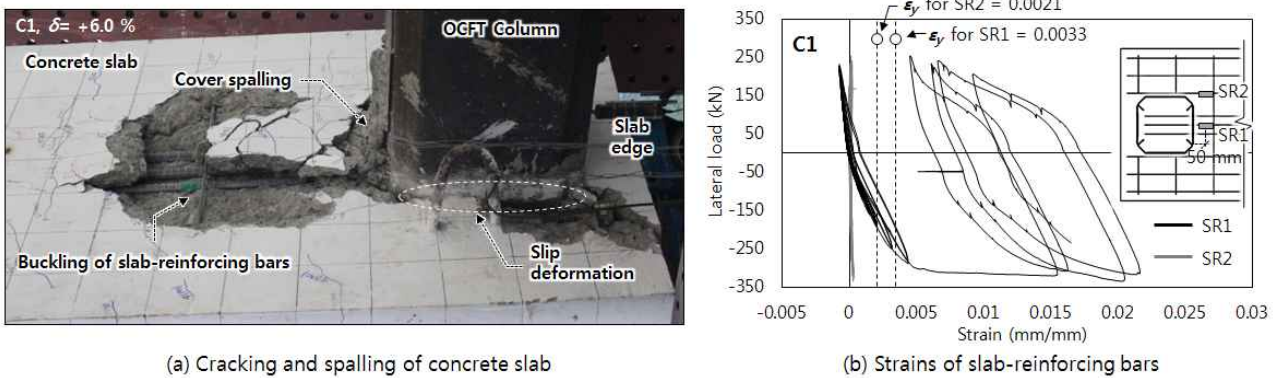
Concrete damage and reinforcing bar strains in slab
